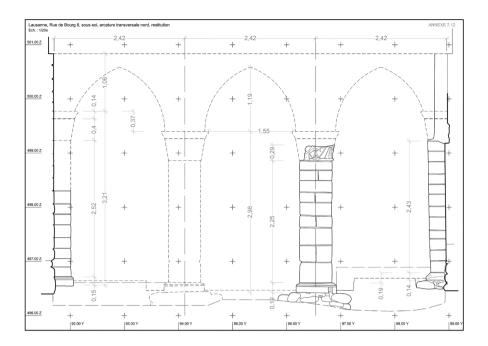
Lausanne Rue de Bourg 8. Reconstruction of the north transversal arch (Archeotech SA).
